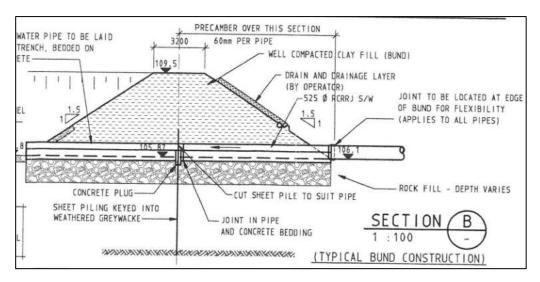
Typical bond construction detail (Courtesy of Royds Consulting, 1995)
